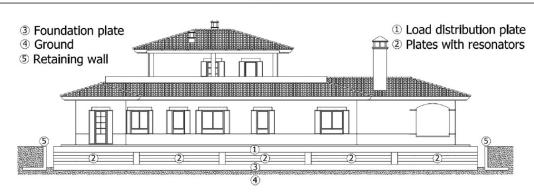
Schematic of the composite foundation built beneath a residential house ([43])
